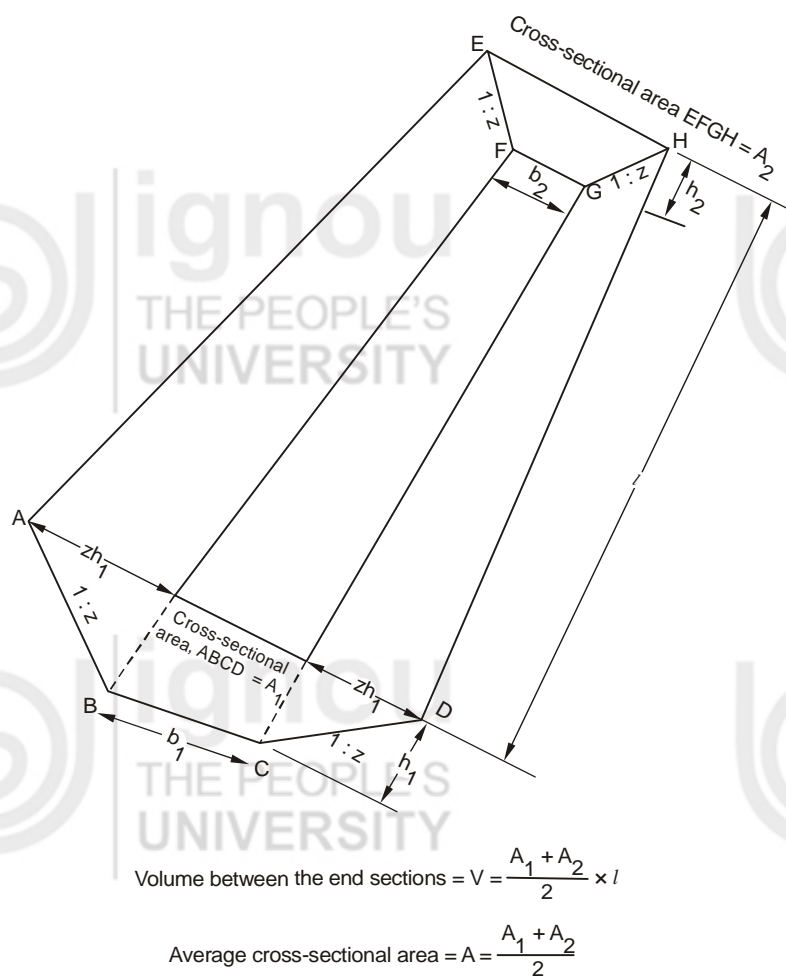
Isometric View of a Road, Fully in Cutting, with End-section 'l' Metres Apart
